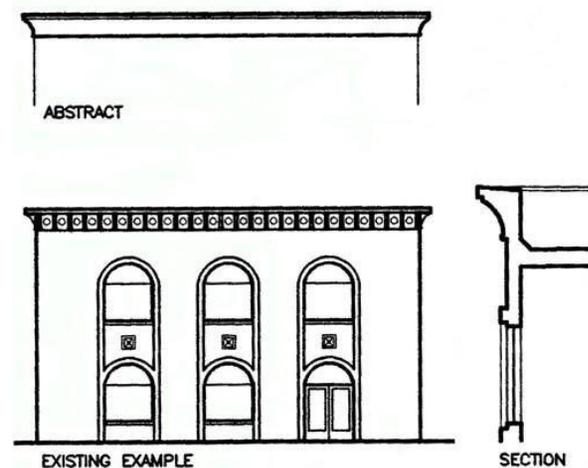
A contemporary interpretation of a classical parapet forms a single, strong, building cap.
